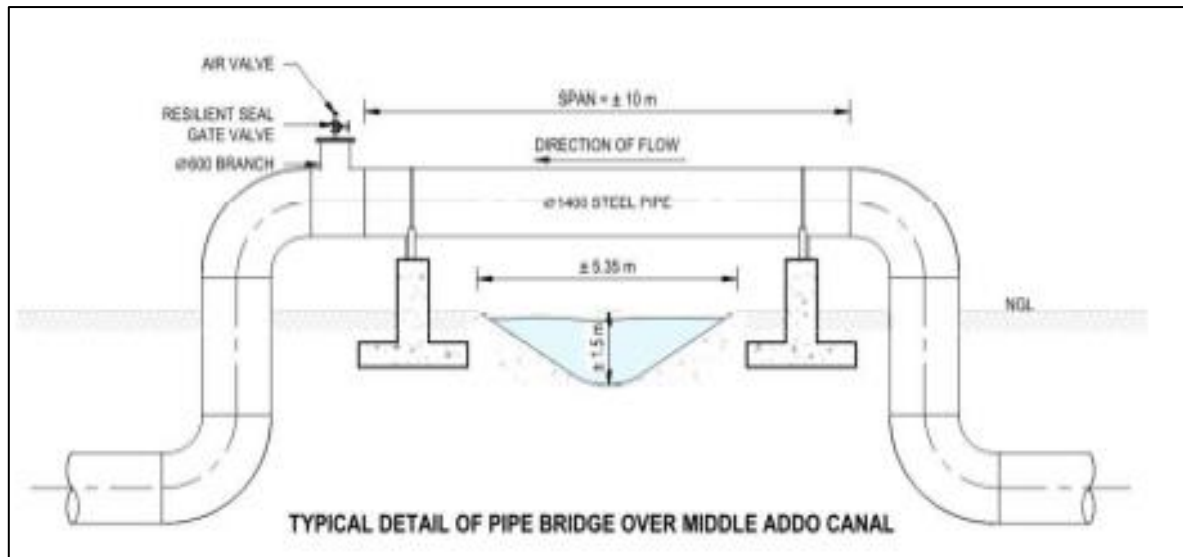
Typical detail of Pipe Bridge over Middle Addo Canal (DWS, 2020)
